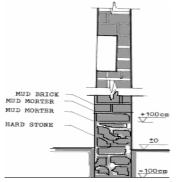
The wall and foundationFig. 1Source (Ahmed, 1985)Figures (12, 13) source (Almansuri, 2000)
